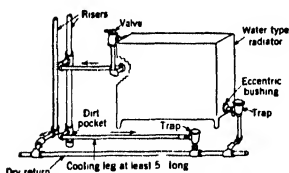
TOP AND BOTTOM OPPOSITE END RADIATOR CONNECTIONS
